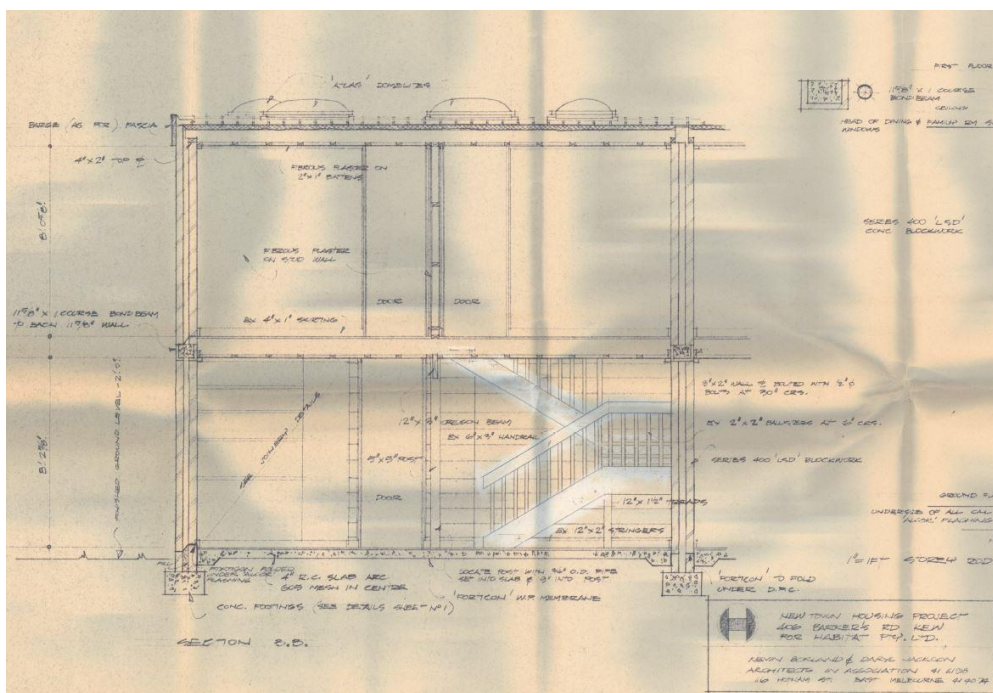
A transverse section through one of the terrace houses (Source: BP 7088).
